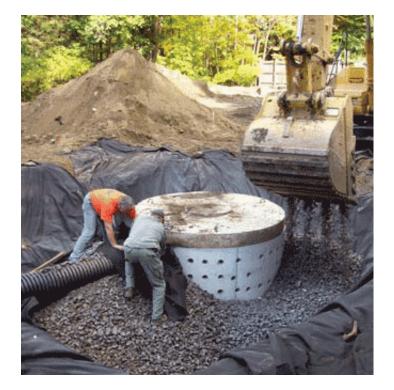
Example of a Drainage Well Installation (*Image Credit: Lake George Association*)
